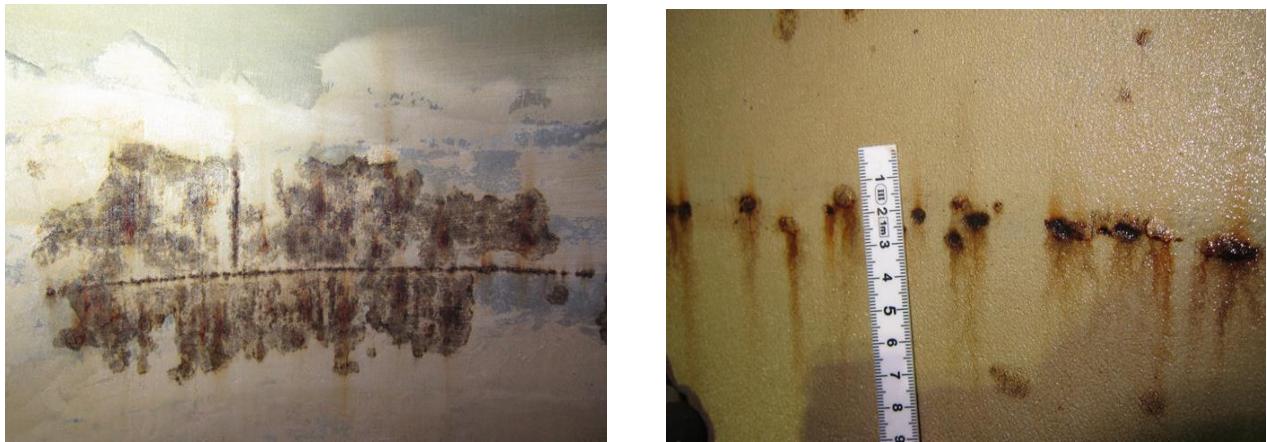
Pittings and corrosion attacks along the weld seam, local missing of the cement mortar layer (October 2014)
